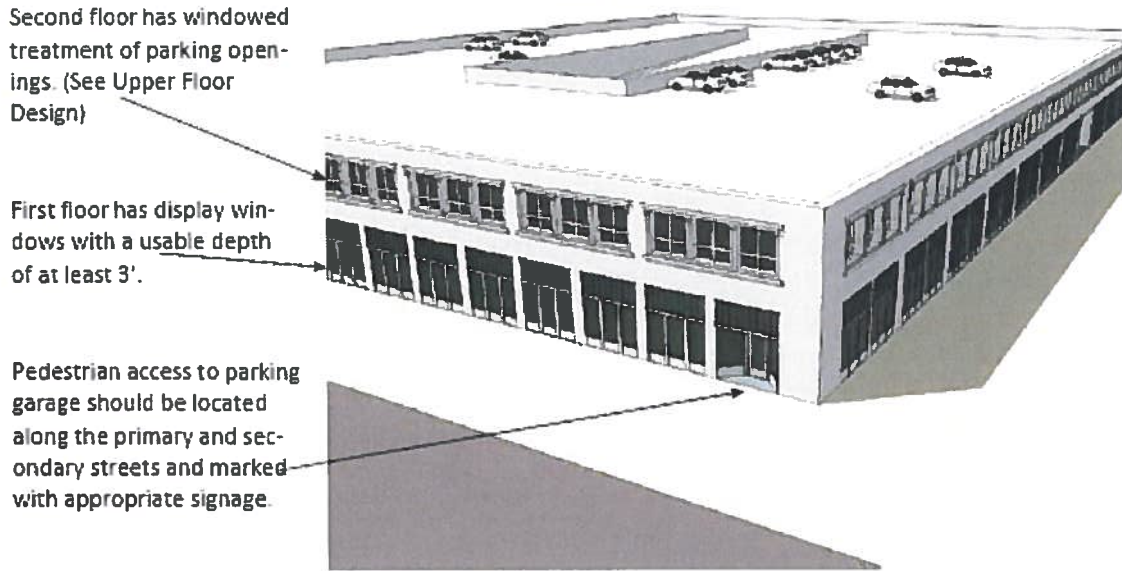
J: Ground First Floor Design, Liner Building
